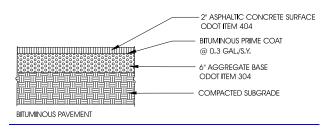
Typical Construction Pavement Sections for Pedestrian Paths
